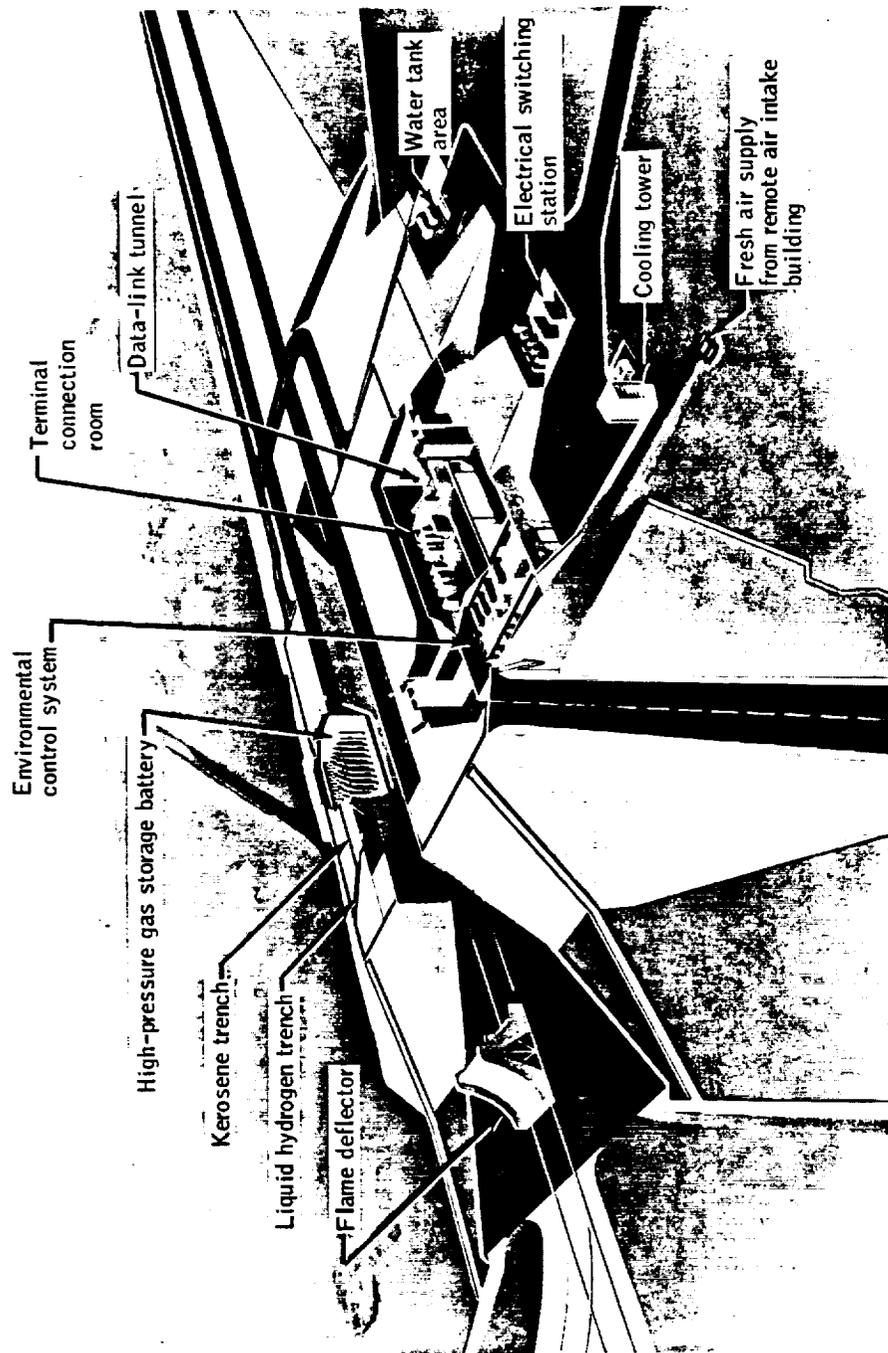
Cutaway view of Pad A, Launch Complex 39.
